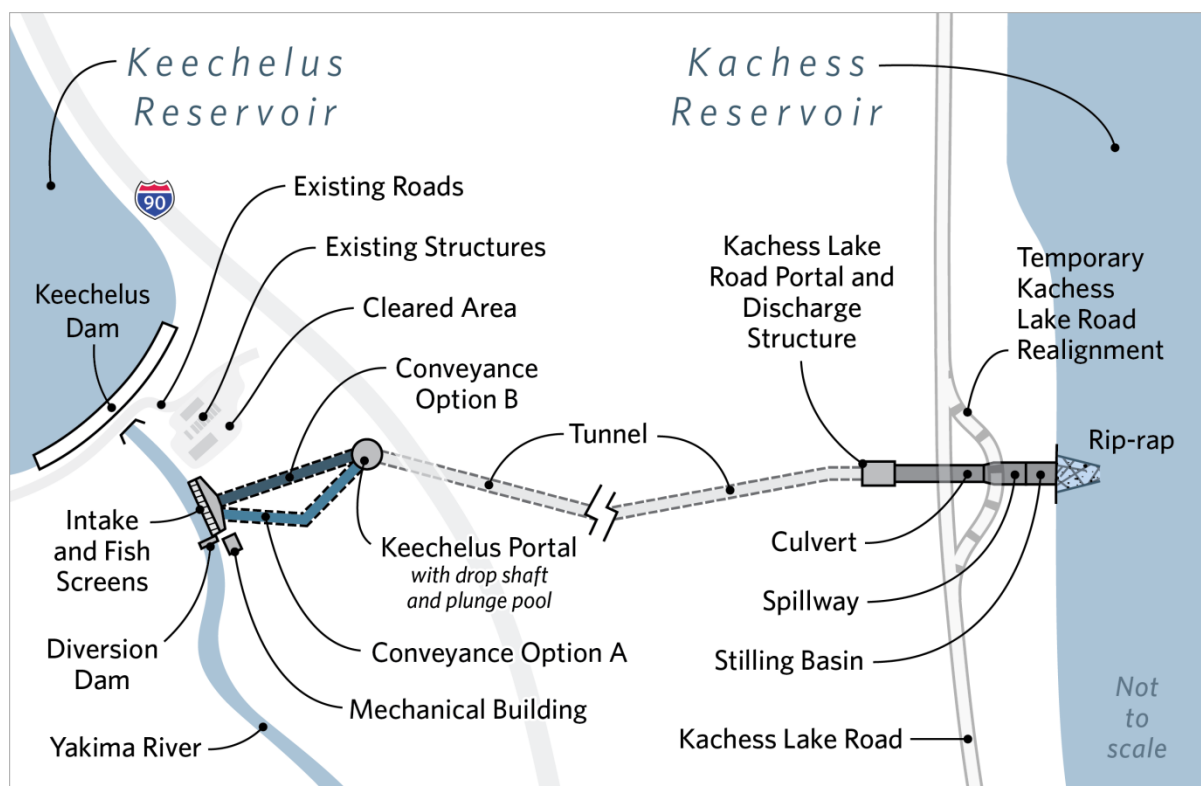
KKC North Tunnel Alignment Conceptual Site Plan
